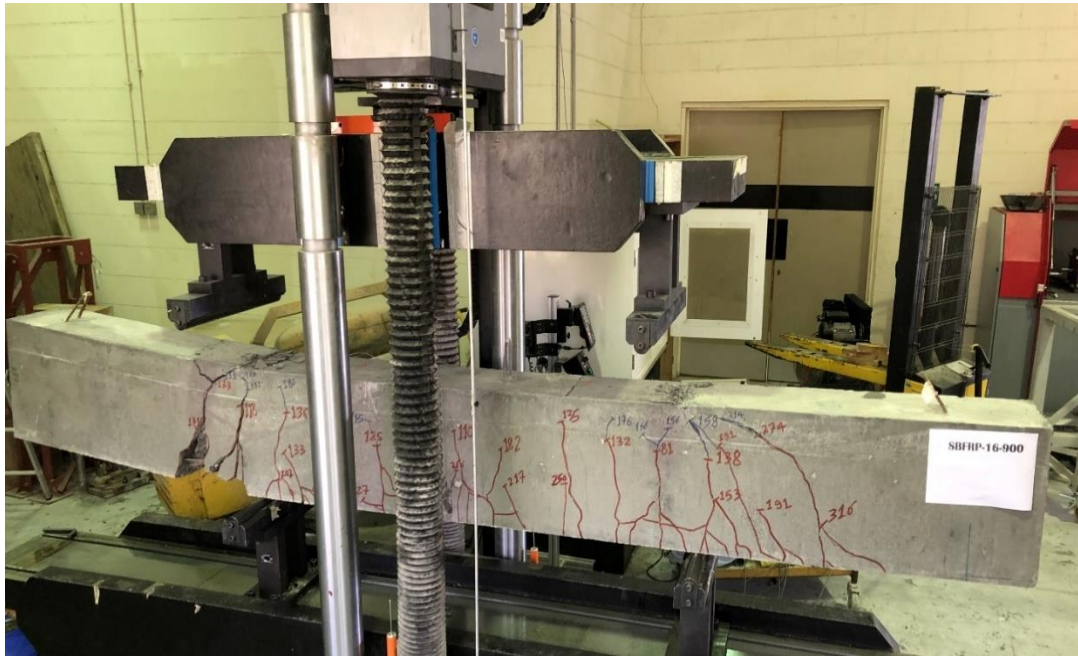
Cracking pattern of beam 8 (SBFRP-16-900)
